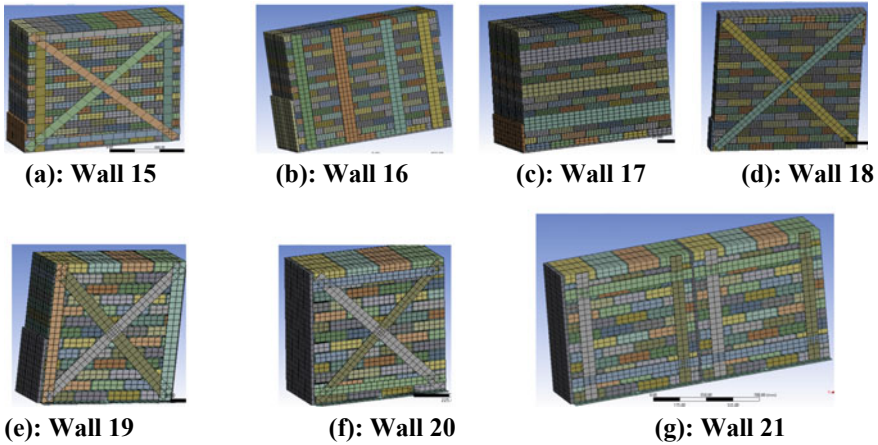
Layout of CFRP strips for masonry walls of Set 2
